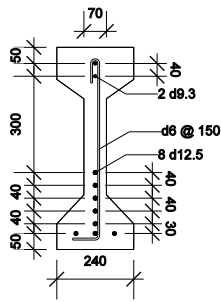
Cross sections and reinforcement details of rectangular specimens (note: units in millimetre)
